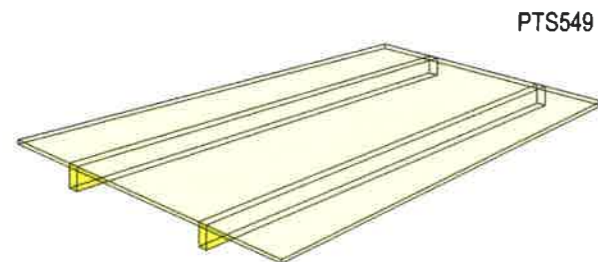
Beam and One-Way Slab Floor System
